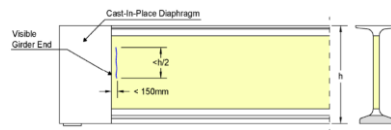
Vertical cracks in NU girders adjacent to C.I.P. diaphragm
